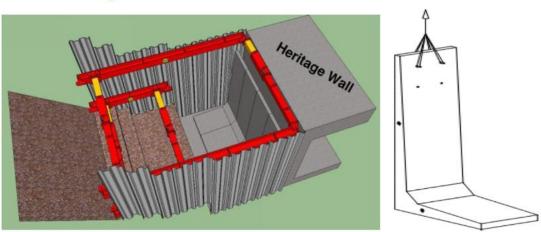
Construction phasing showing temporary works required to excavate and insert pre-cast wall.
